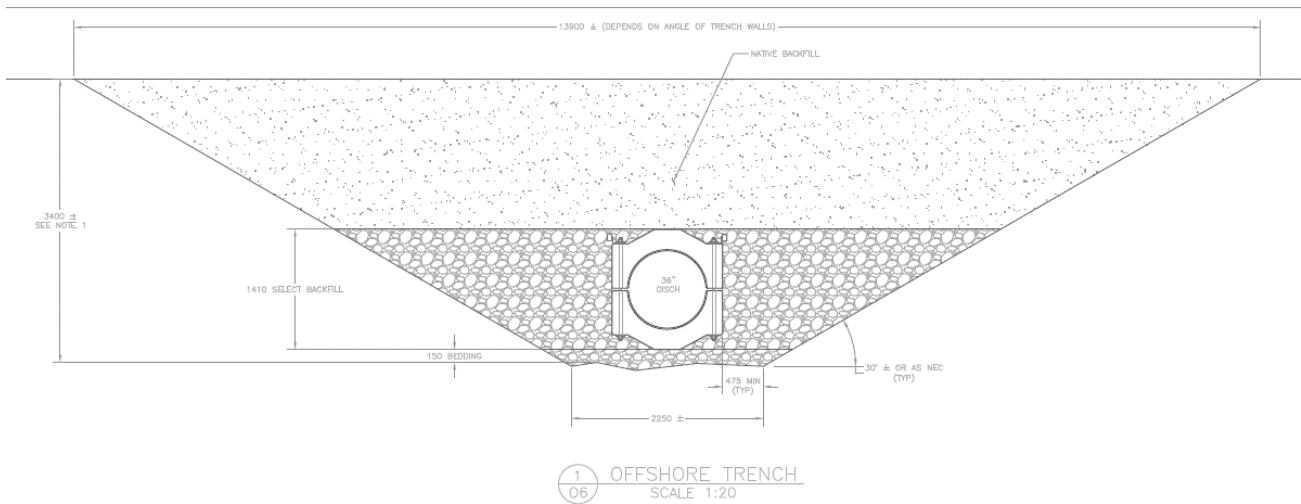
Example of dredged trench for 36" HDPE pipeline for Caribou Harbor Outfall, based on 2:1 side wall slope.
